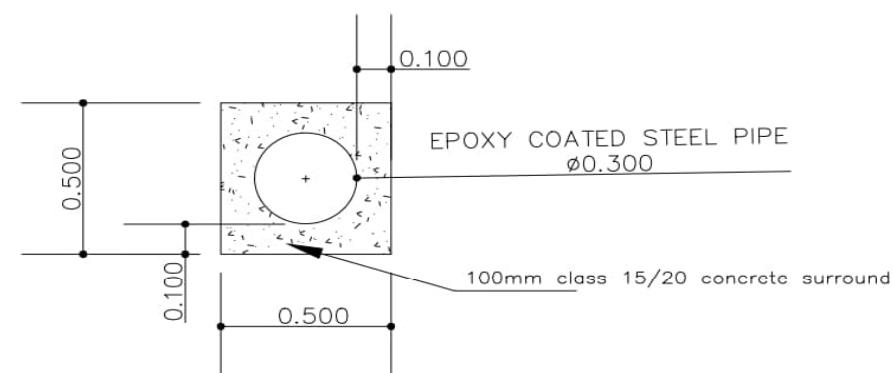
Karagita Design Engineering Layout Plan (6)
